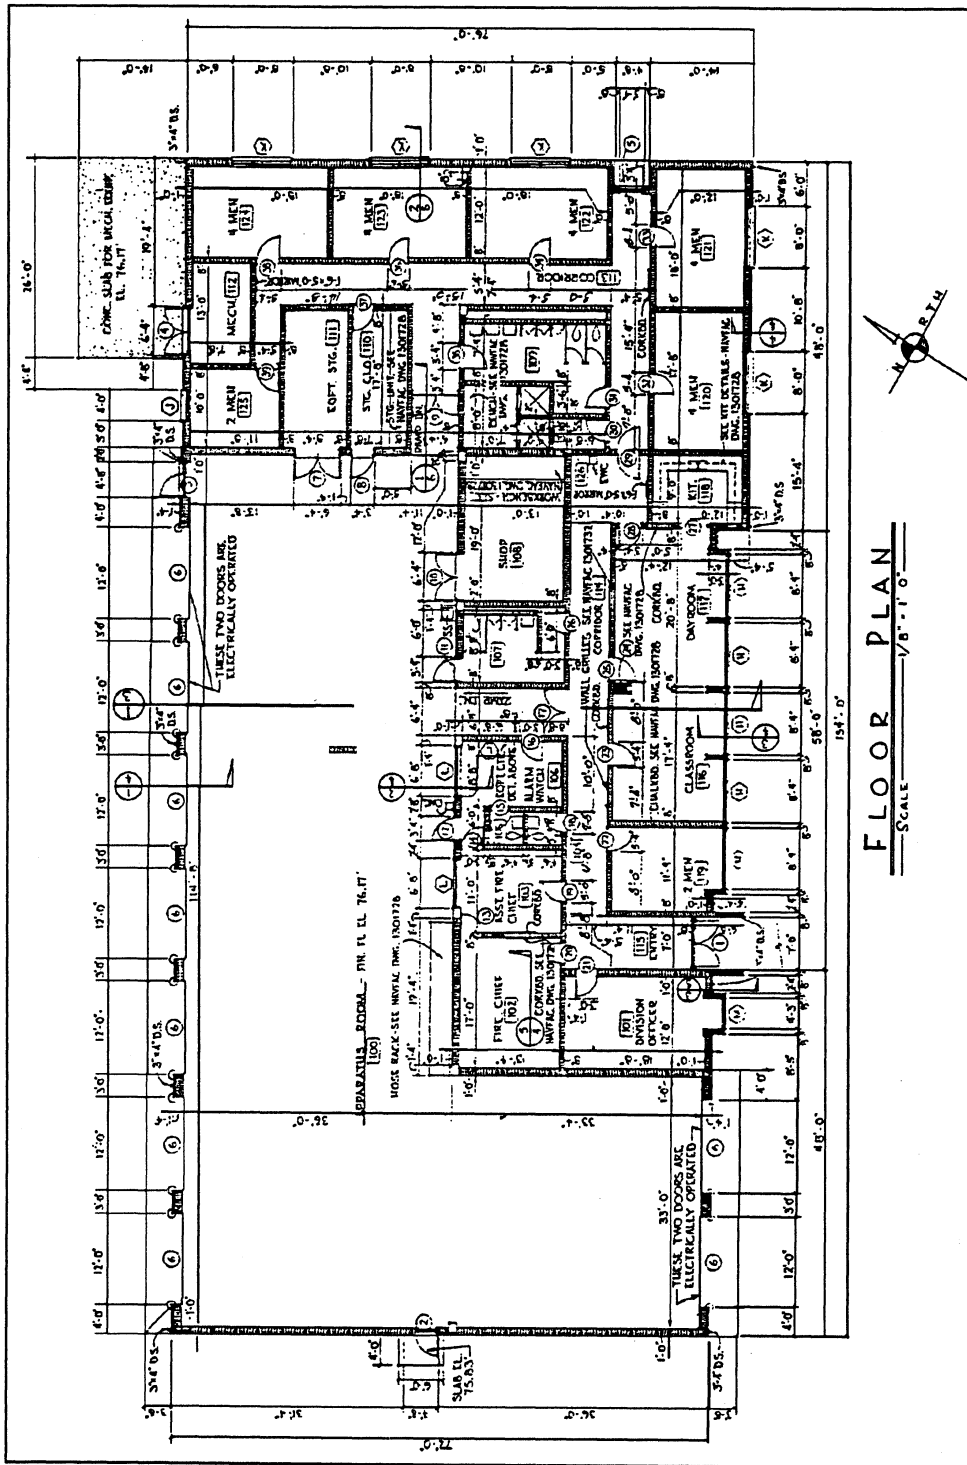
Architectural or floor plan of concrete-masonry construction.
